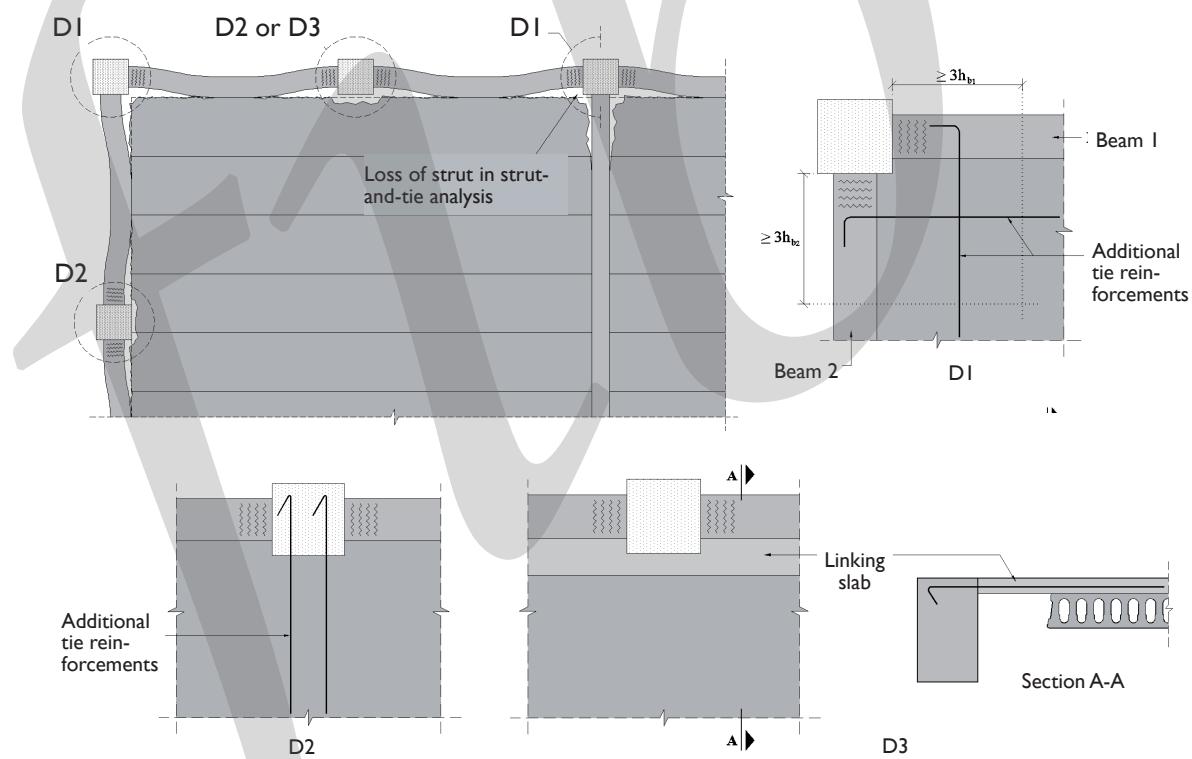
Cracks due to diaphragm action of floor; measures to be taken
